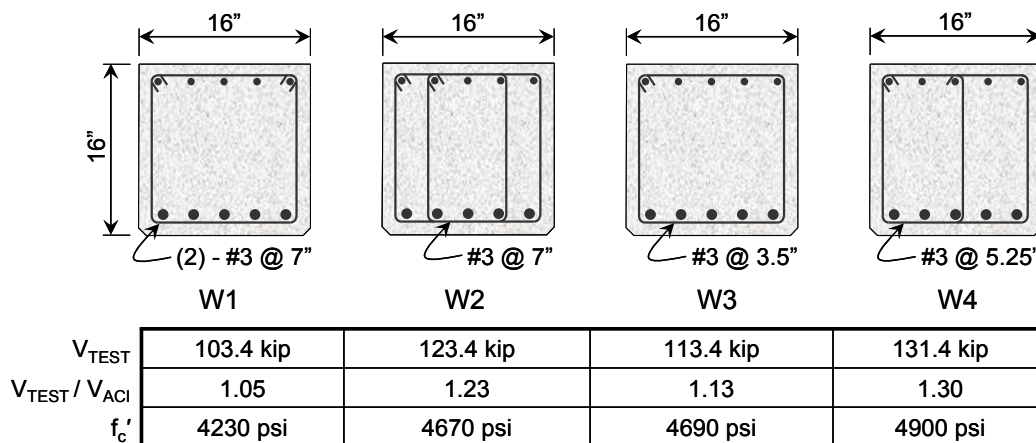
Details of specimens tested by Anderson and Ramirez (1989).
